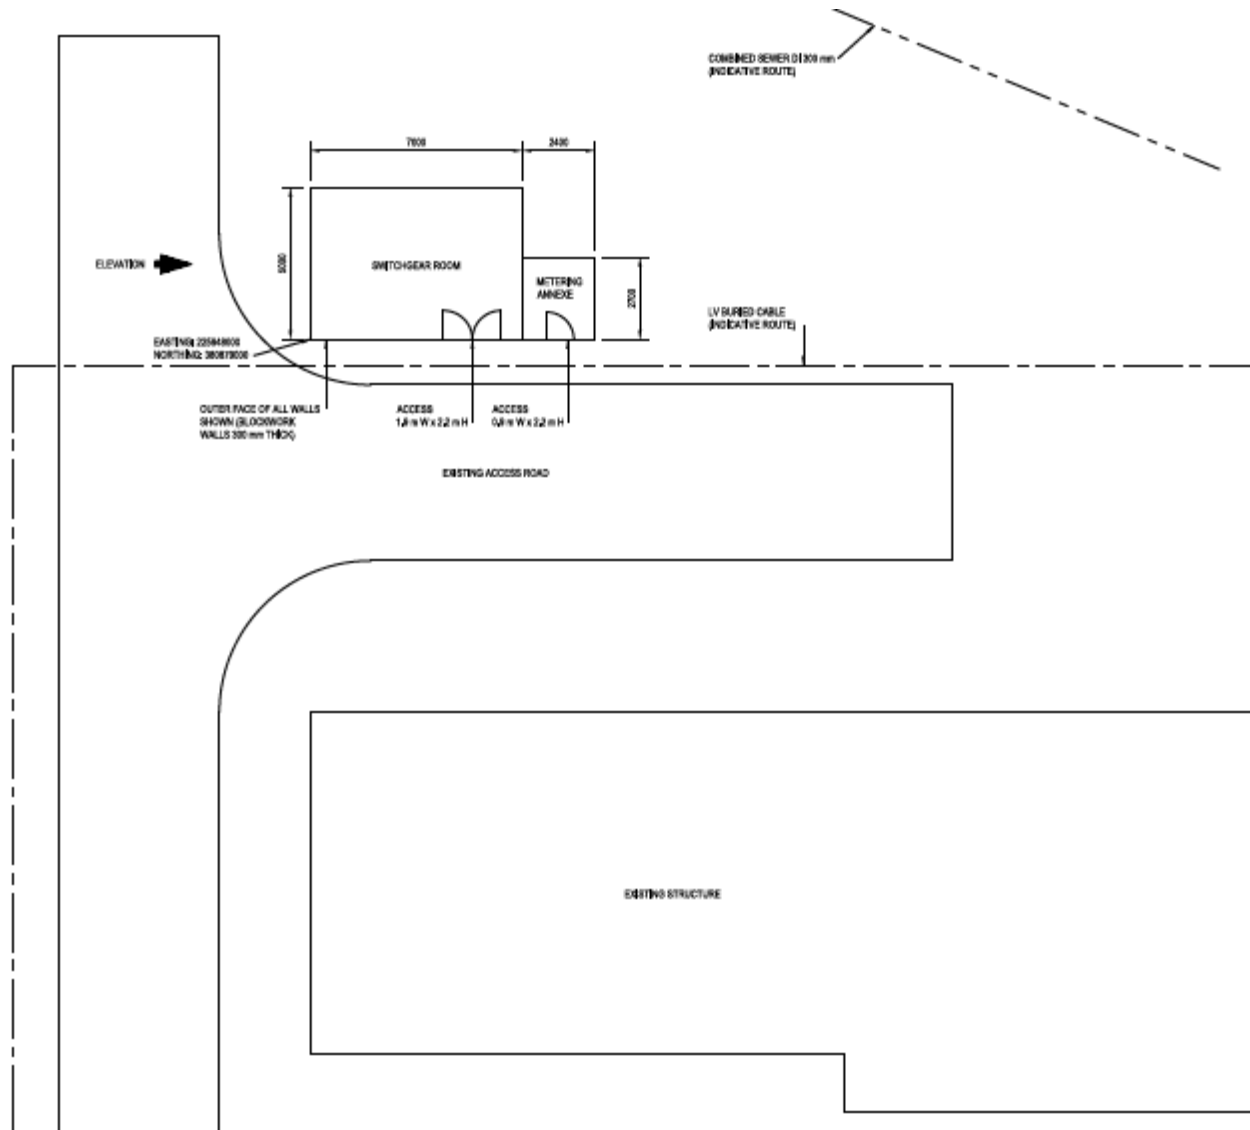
Indicative Switchgear Building (Parc Cybi) Layout
